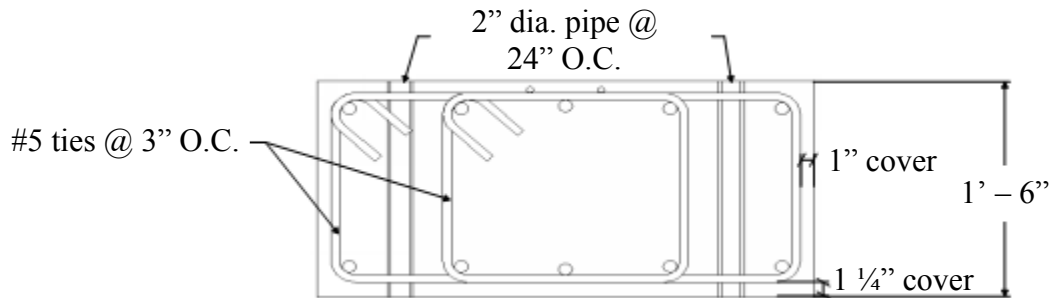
Typical Phase I wall elevation (Rocks, 2012)
